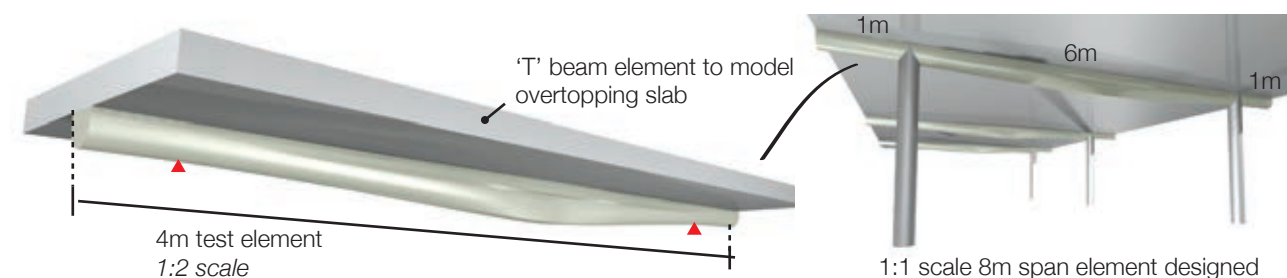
'T' beam element, and potential application to reinforced concrete frame construction.
